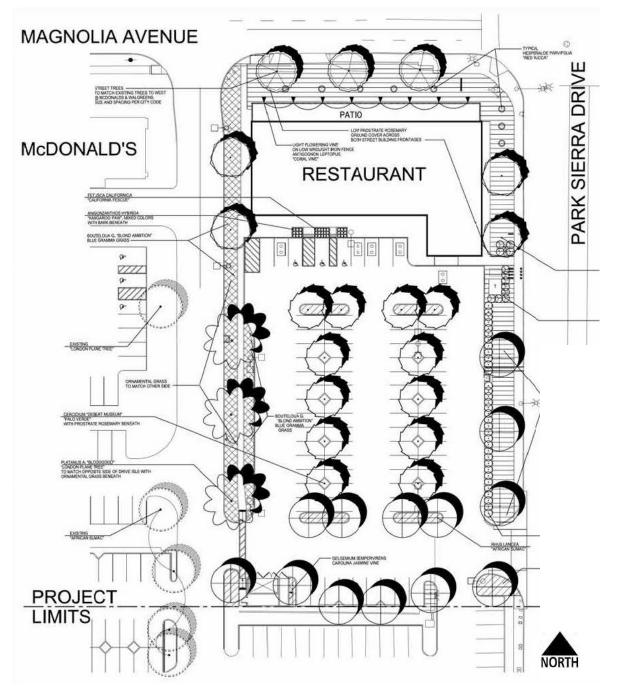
Project Plans (Conceptual Landscape Plan)
